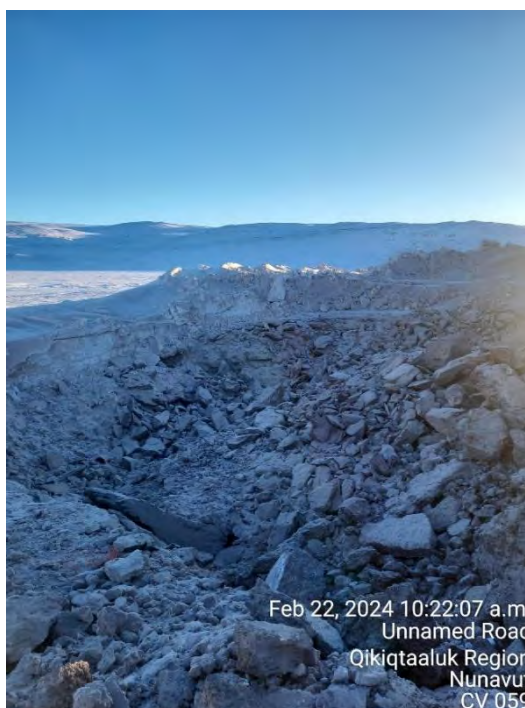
CV-059 looking southeast at the blasting excavation in the area of the culvert inlet (February 22, 2024)
